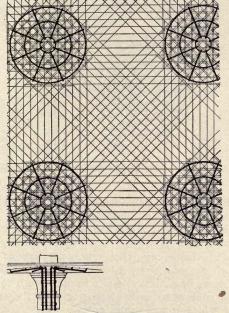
Floor Slab Reinforcement, Mushroom System.
